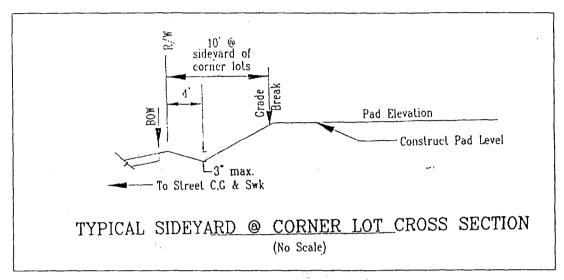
Typical Sideyard at Corner Lot Cross Section
